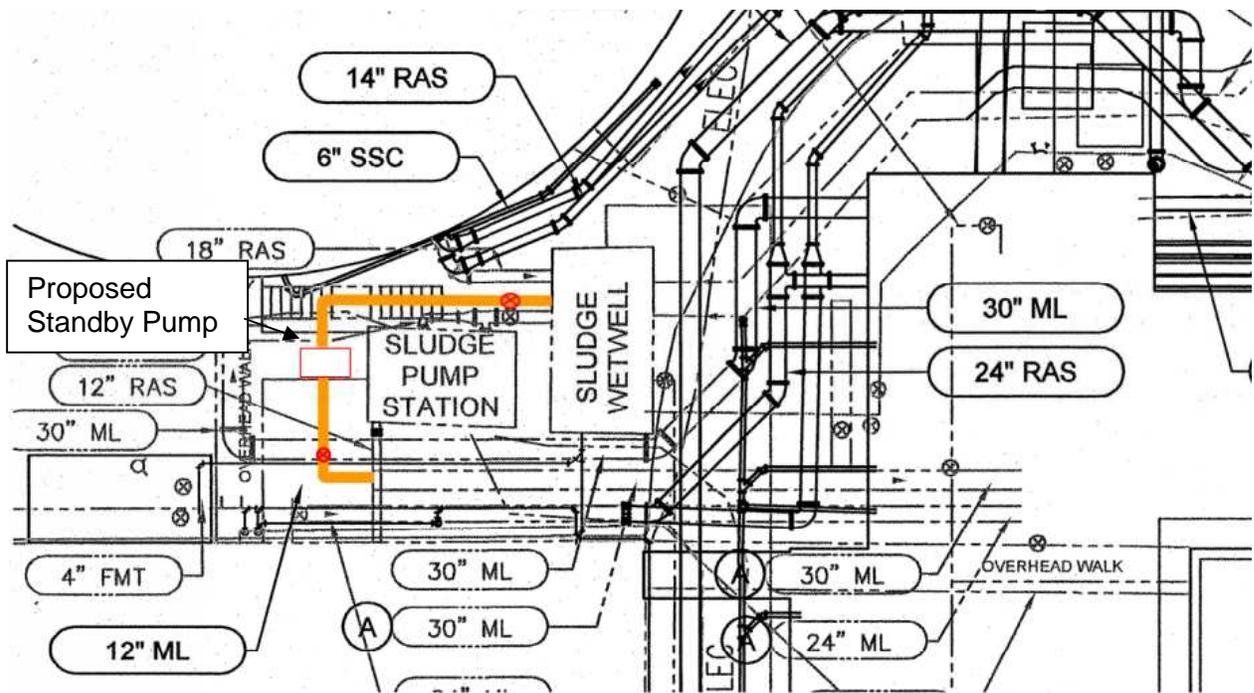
Proposed Standby RAS Pump and Piping for Clarifiers 2 and 3
